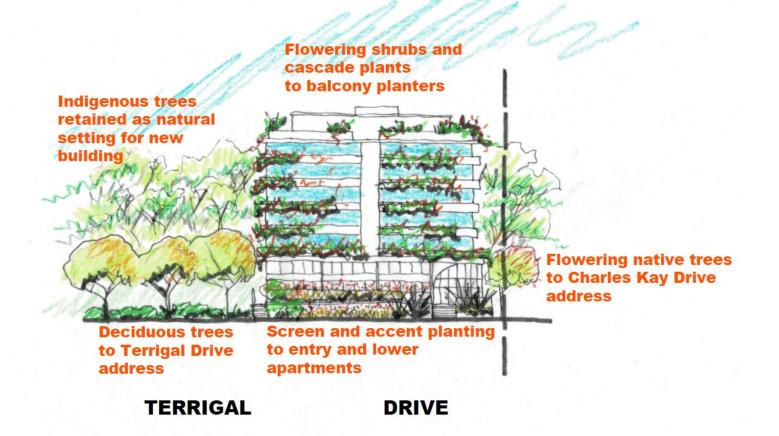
DETAIL PLAN A – TERRIGAL DRIVE PEDESTRIAN ENTRY ZONE AND RESIDENTIAL APARTMENTS
